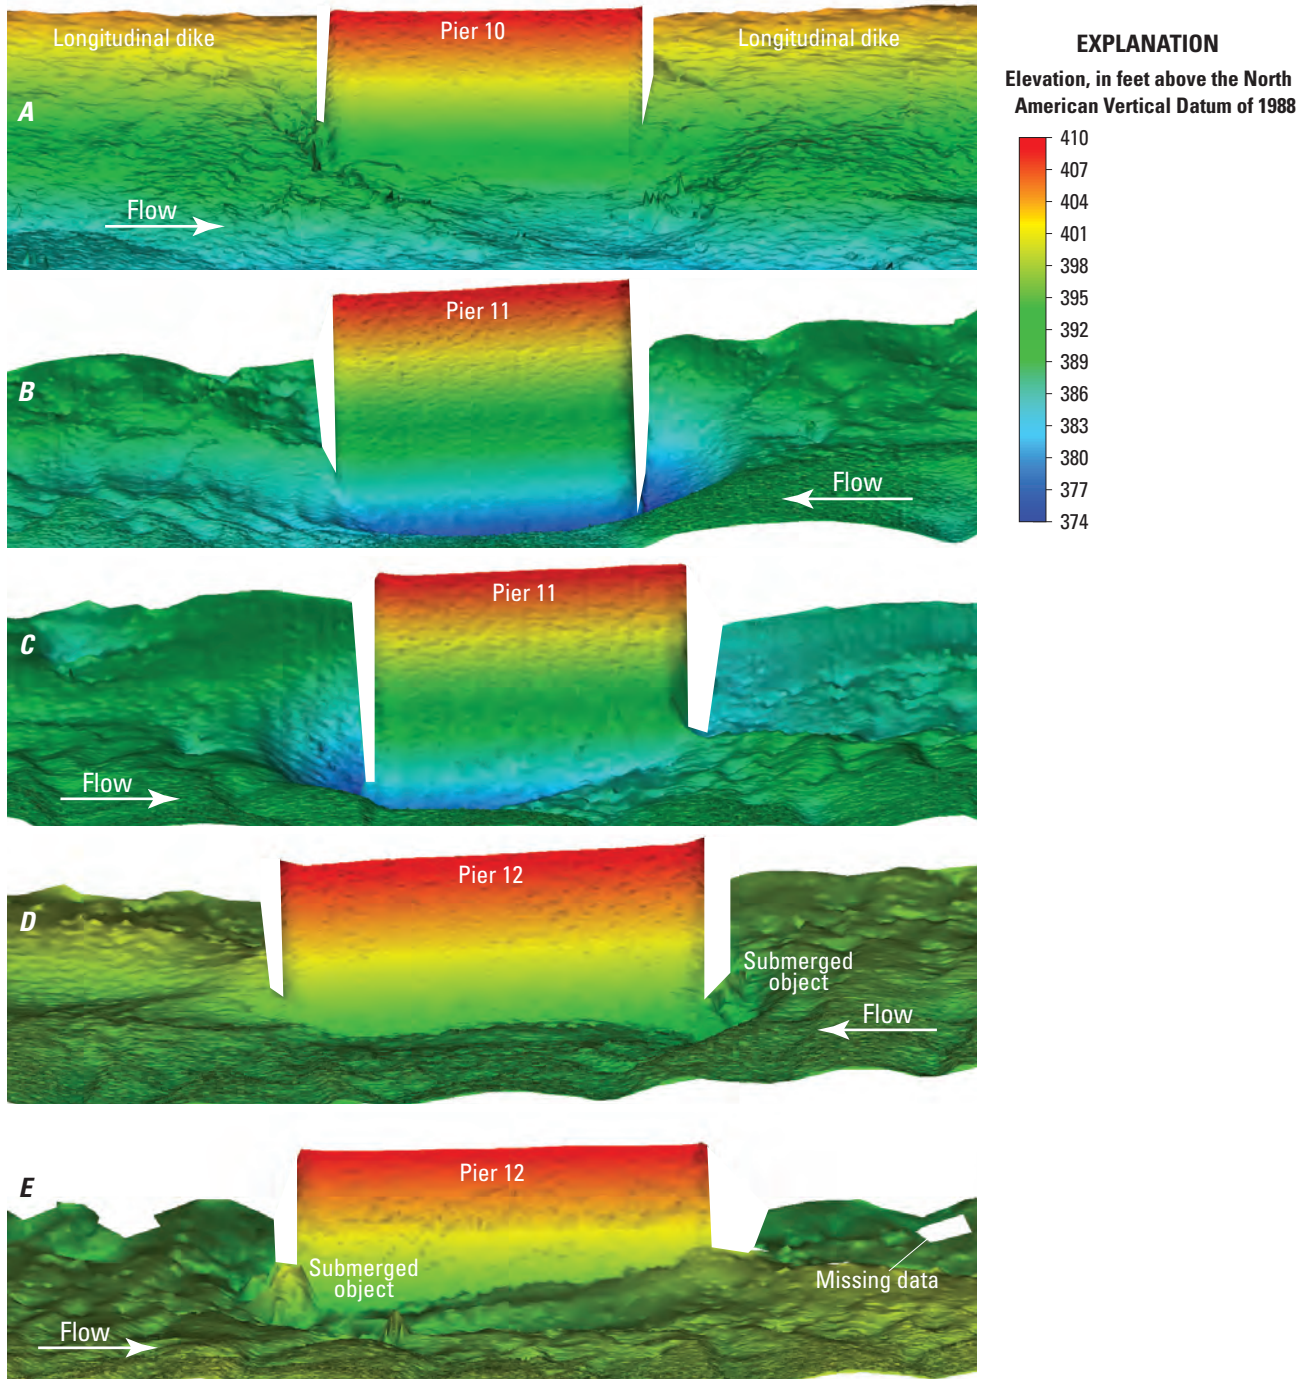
Shaded triangulated irregular network visualization of the channel bed and piers of structure A3047 on U.S. Highway 67 crossing the Missouri River near St. Louis, Missouri. *A*, right (south) side of pier 10. *B*, left (north) side of pier 11. *C*, right (south) side of pier 11. *D*, left (north) side of pier 12. *E*, right (south) side of pier 12.
